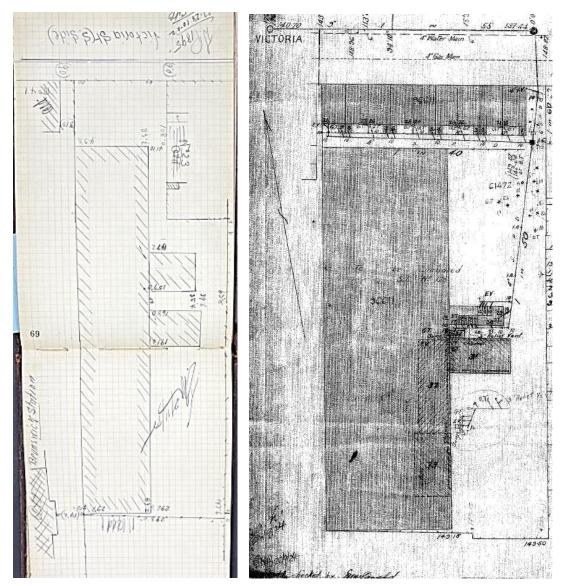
(Left) Plan of the site from 1922 showing a factory building on the western boundary of the site, with two building forms to the east; (Right) Property Service Plan of the site in 1924, showing the factory on the western extent of the site, with some additions to the east, and the cottages at the northern end of the site
